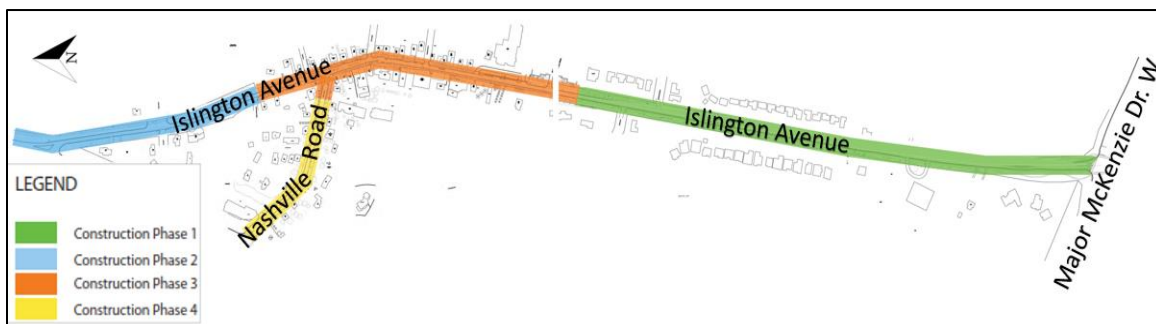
Islington Avenue Streetscape Master Plan (2011) Phasing
